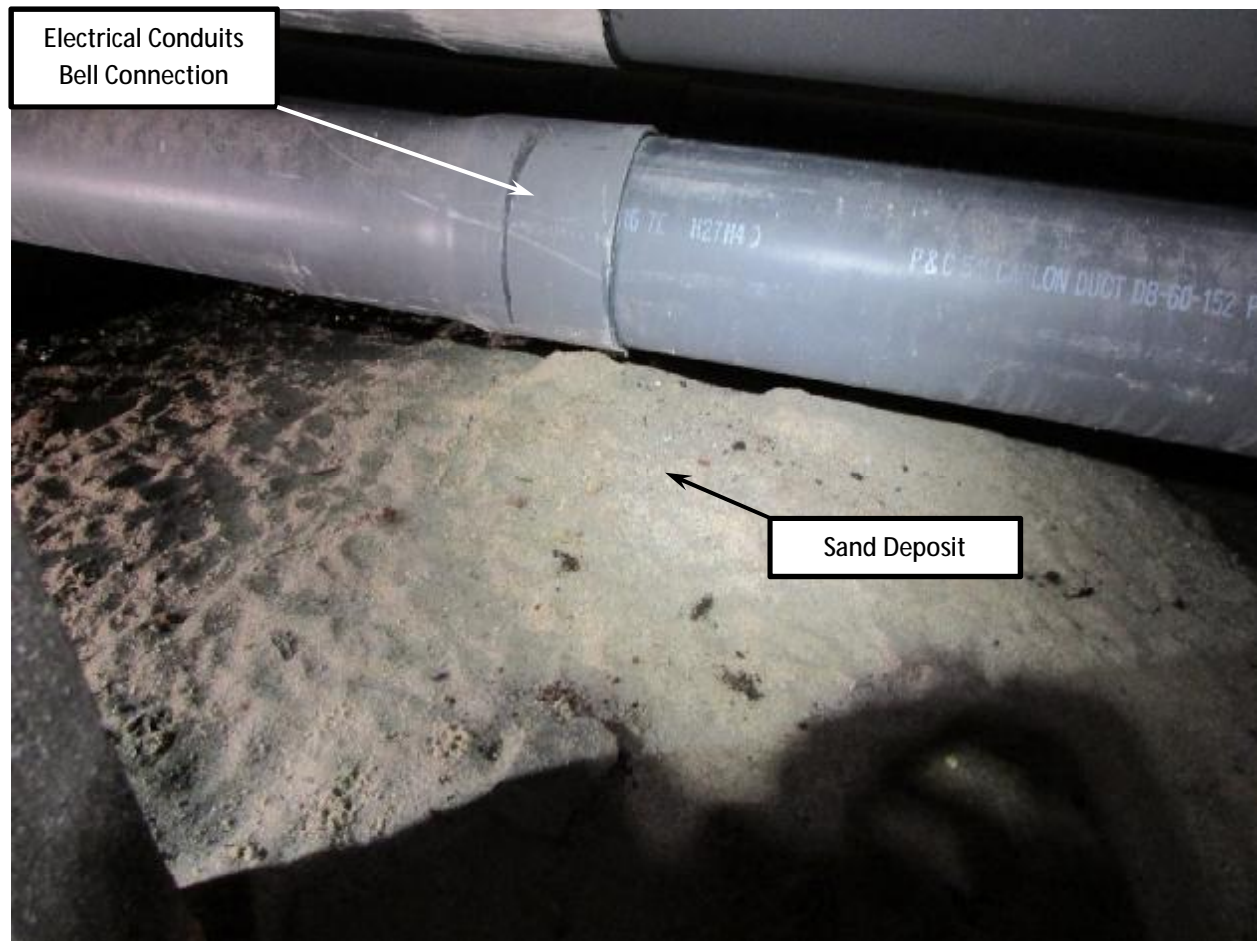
Deposited sand within the bridge cell. Sand is not typically found inside box girder bridges.
